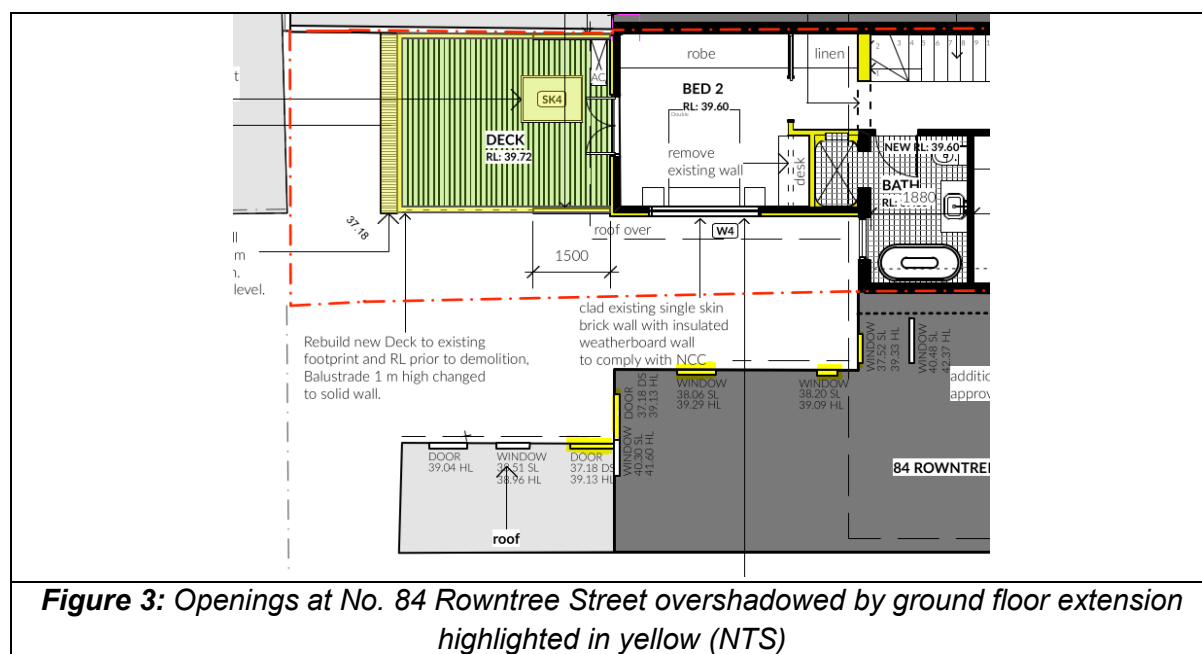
Openings at No. 84 Rowntree Street overshadowed by ground floor extension highlighted in yellow (NTS)
